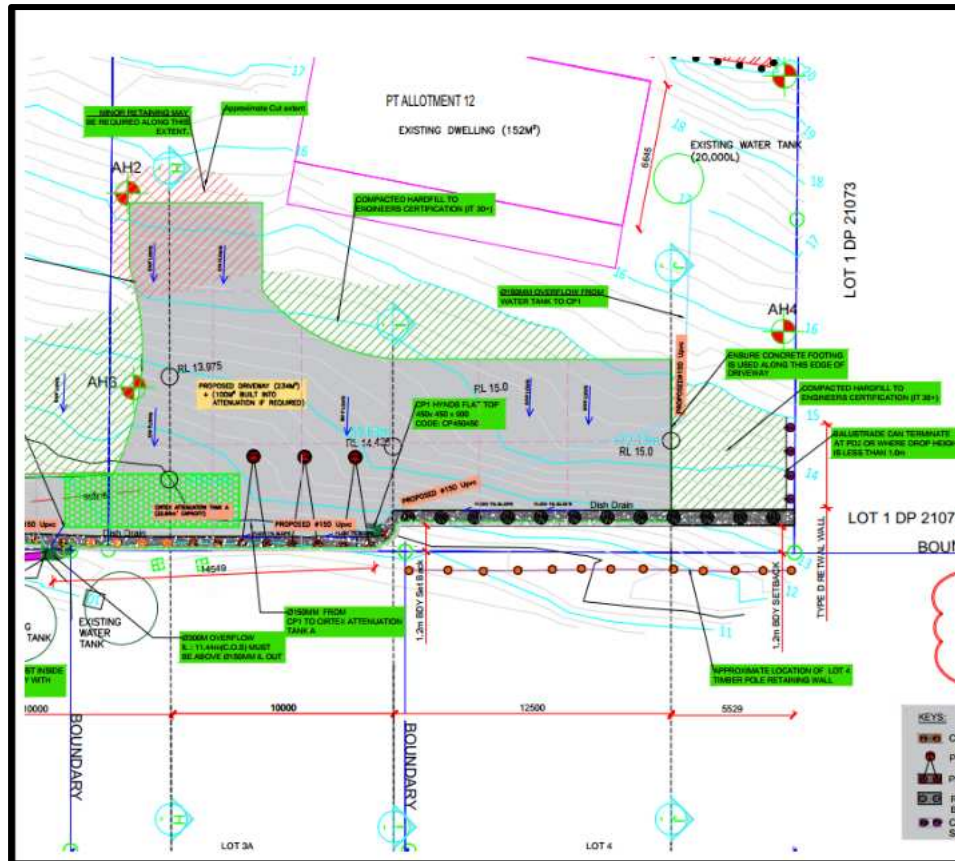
Sheet SR2B of the Plan Set showing the retaining wall and driveway within 15 Chapel Street and the adjoining allotments.
